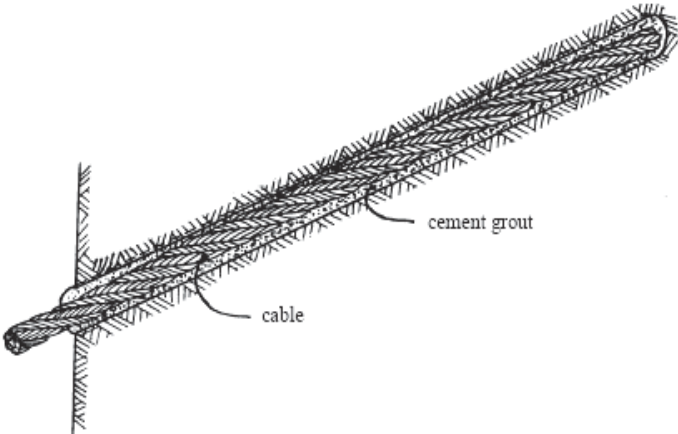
Schematic view of a typical cement grouted cable bolt [19]
